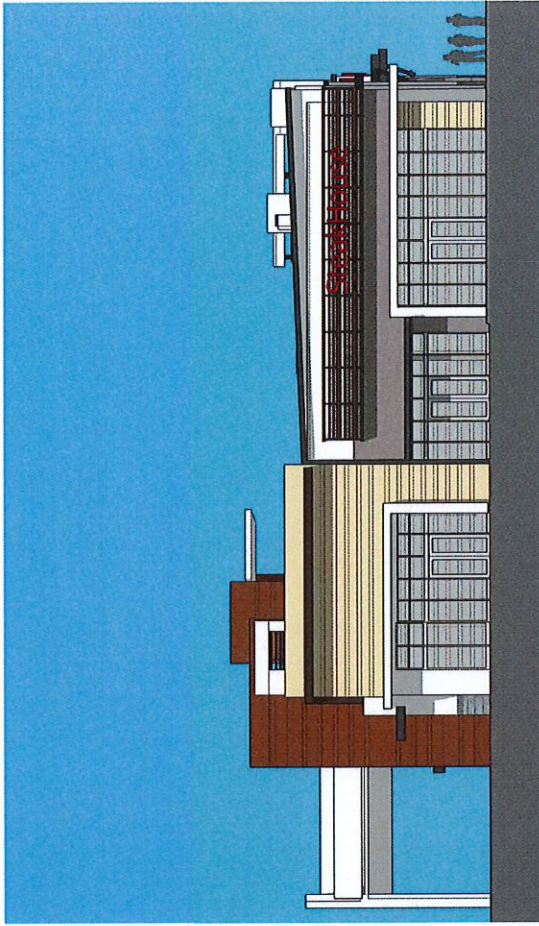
New Commercial Development at SE corner of NW 87th Ave and NW 56th St. Source: Modis Architects application package for site plan review (August 24, 2018)
